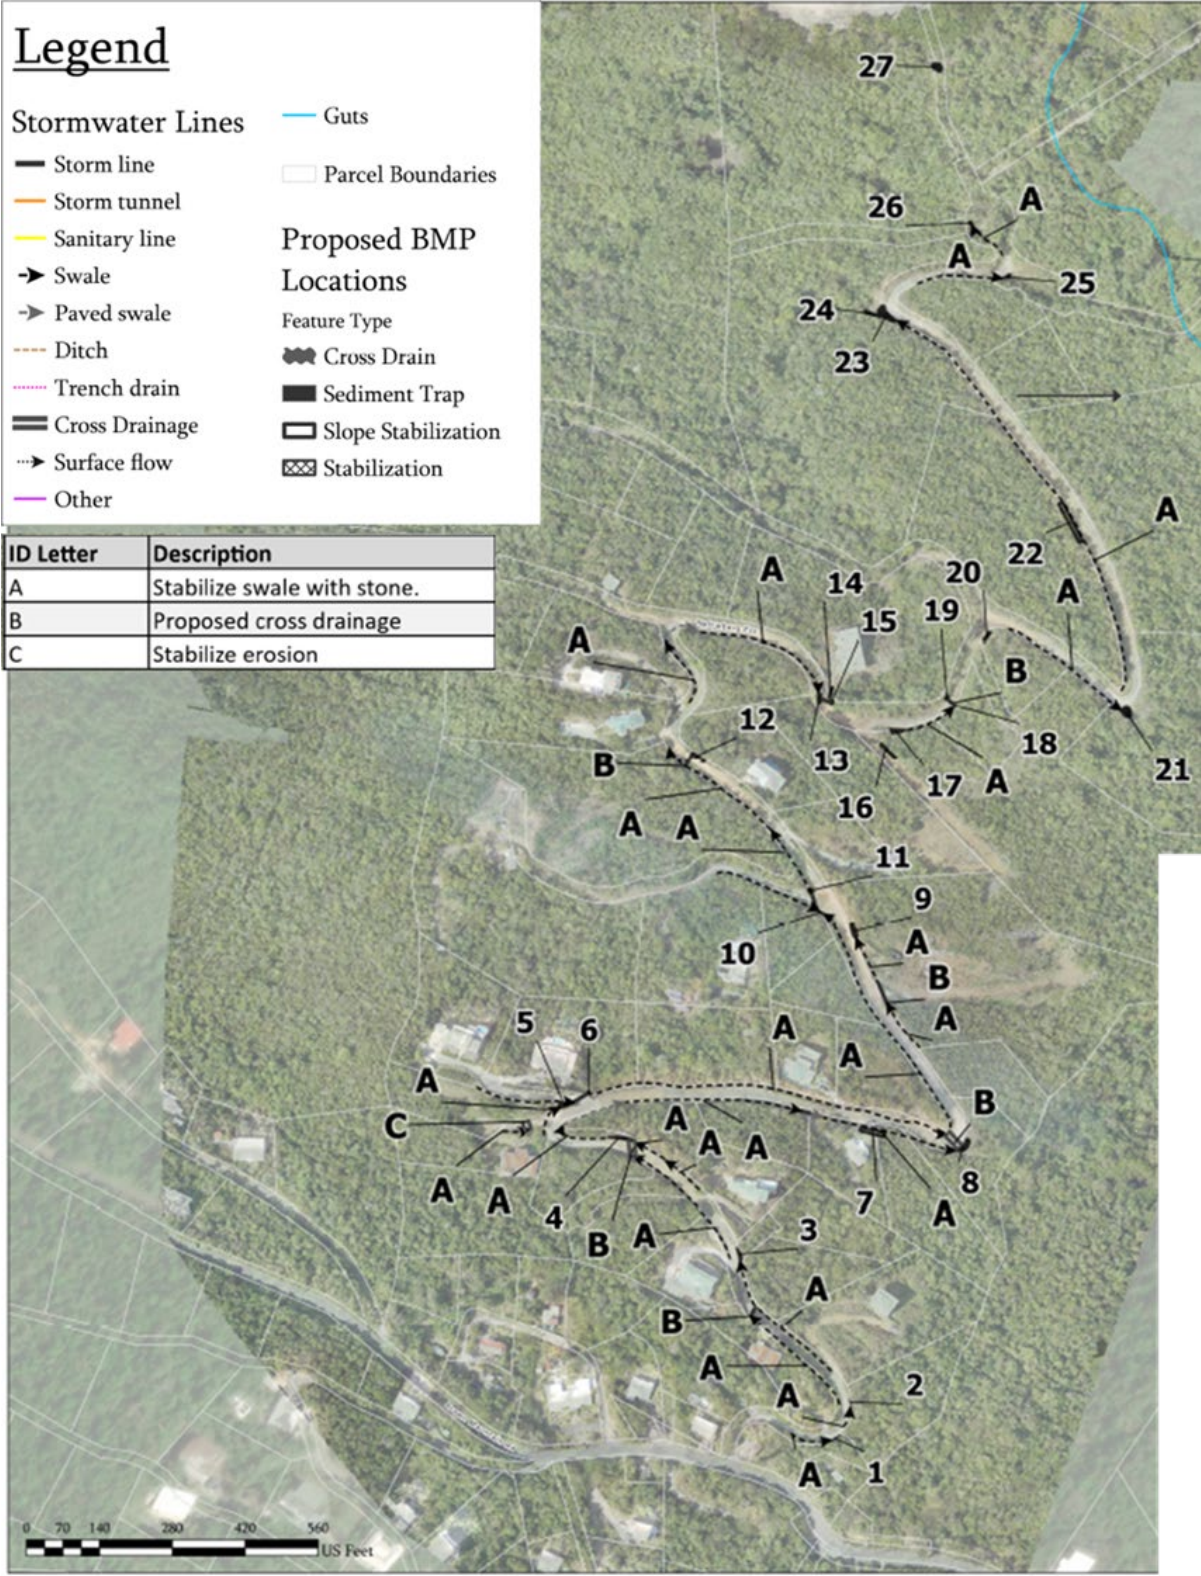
Improvements are proposed along the unpaved road improve water quality and stormwater conveyance.
